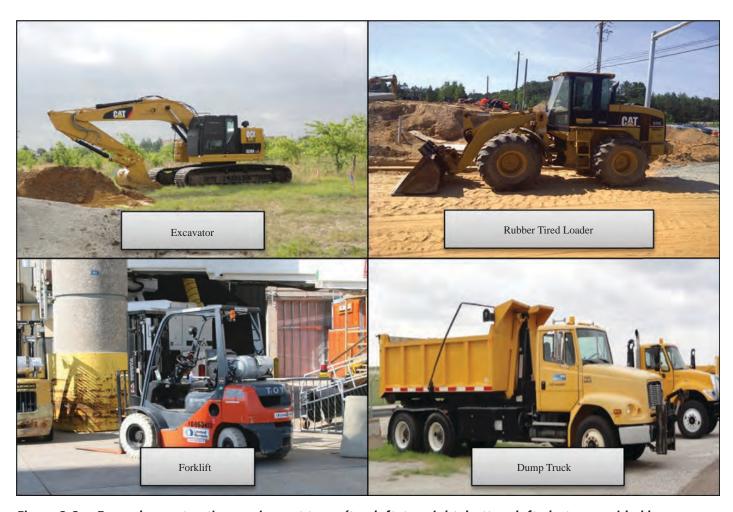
Example construction equipment types (top left, top right, bottom left photos provided by Kris Russell of Dallas/Fort Worth International Airport; bottom right photo by Wyle, Inc.).
